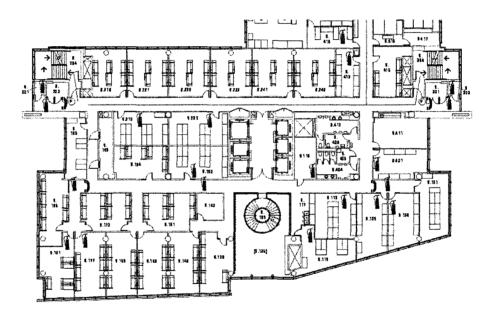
Part of Floor Plan with Fire Equipments Signs
